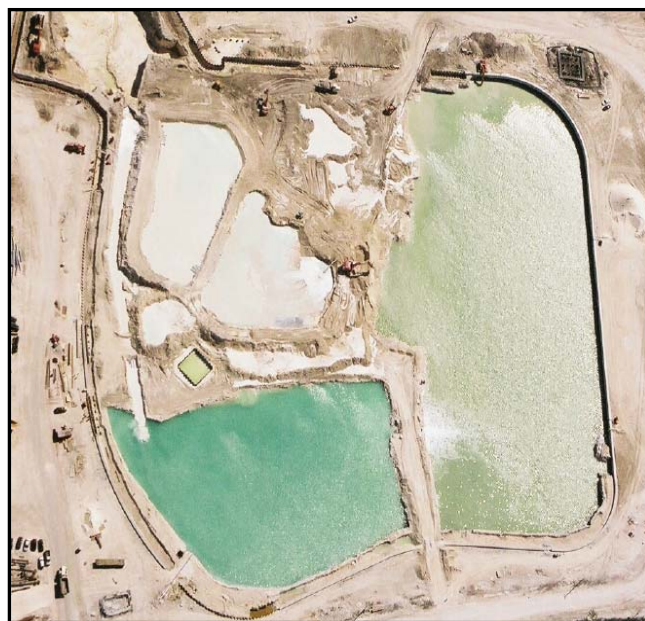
Example of Sectioned Dewatering/ Settling Basin
